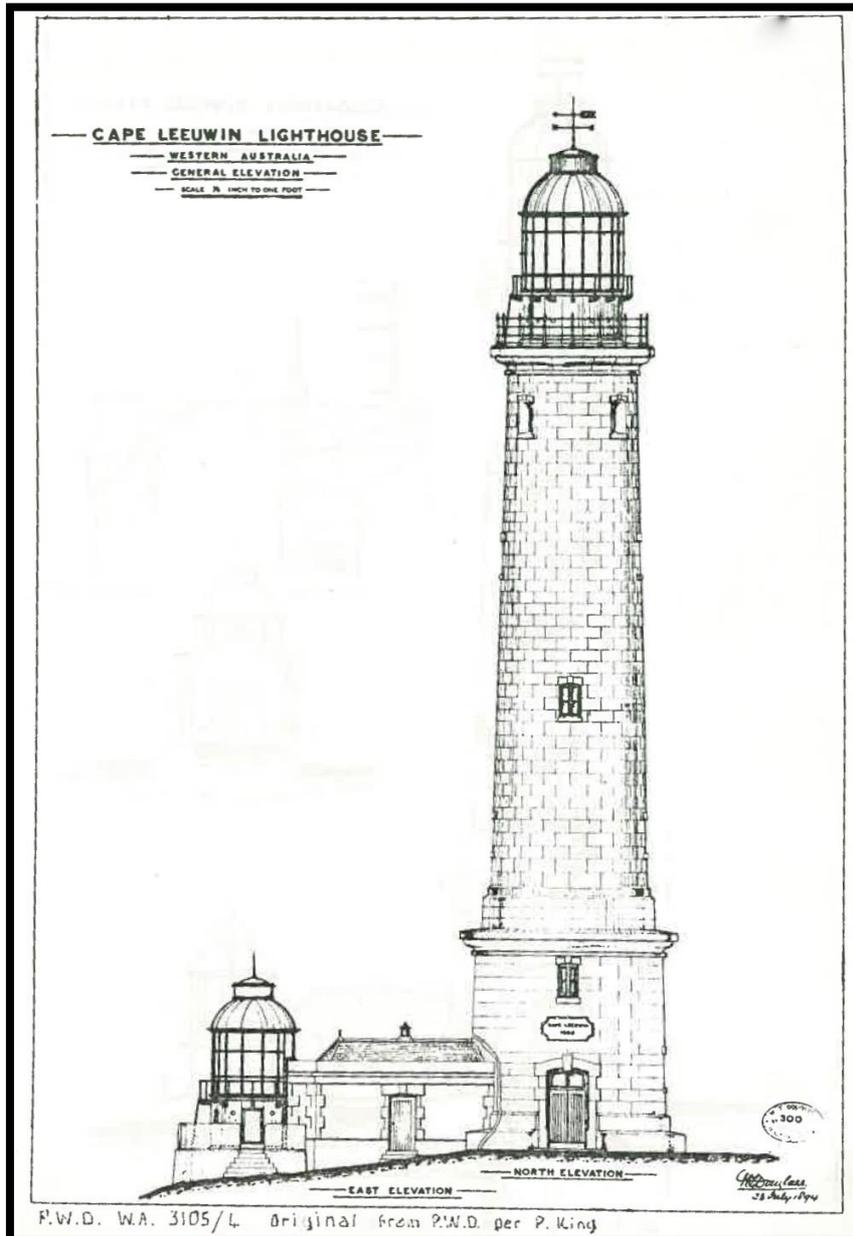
The original design elevation drawing, showing the additional smaller lighthouse originally planned to house a red warning light, separated from the main tower by the fuel store. The second lighthouse was never built. (The image has been taken from: Watson, p. 19)
